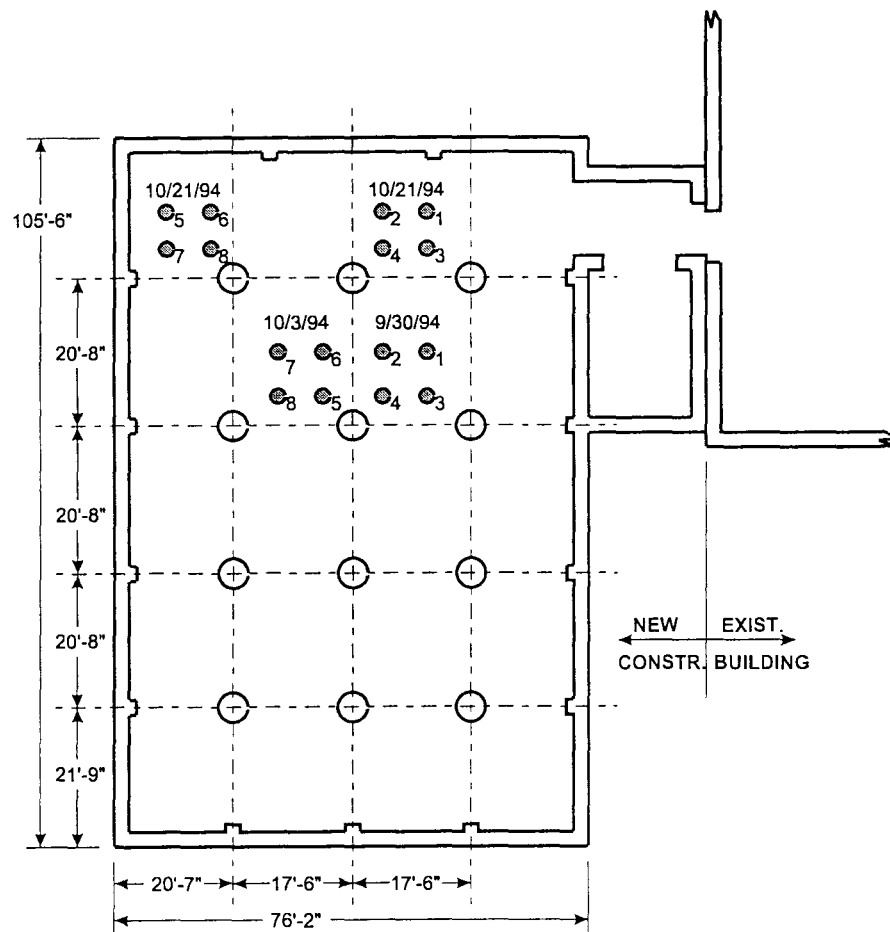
Floor plan and data collection locations for East Ave. Library storage facility.
